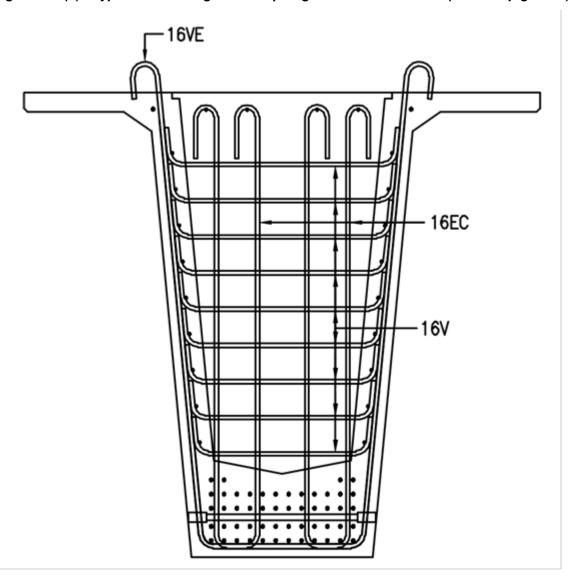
(c) - Typical reinforcing set in diaphragms and around voids (1800 deep girders)
